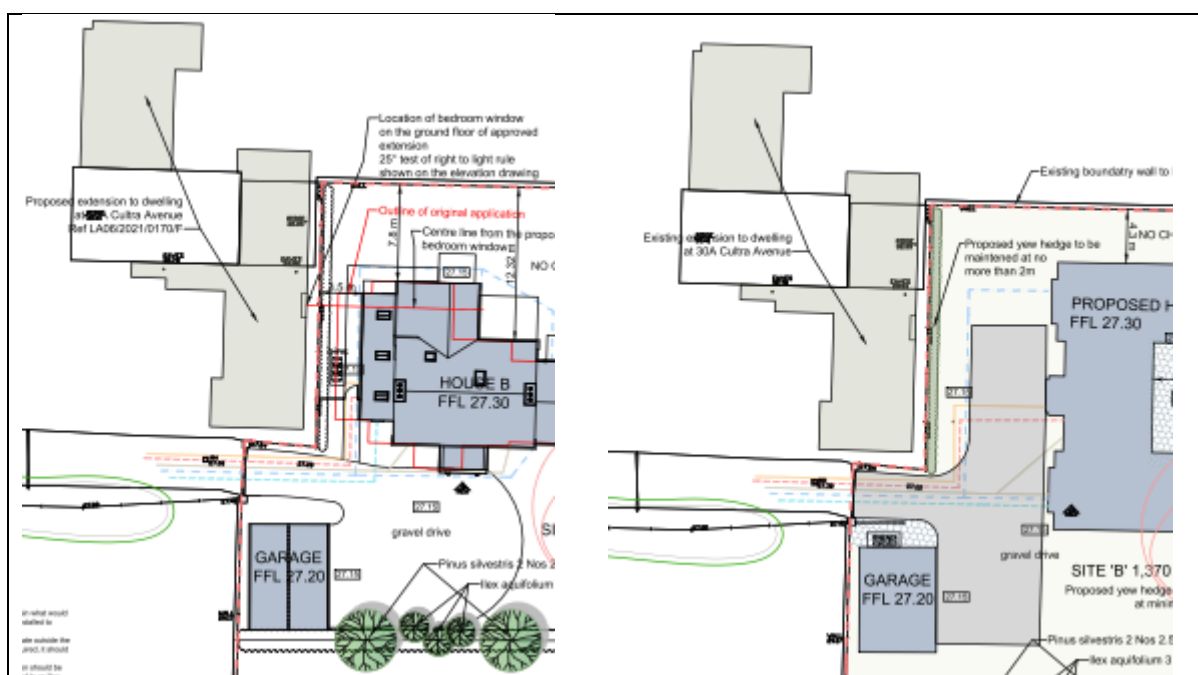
House Type B boundary with extension to 30A Cultra Avenue, as first proposed (08) and the latest proposal site plans (08C).
